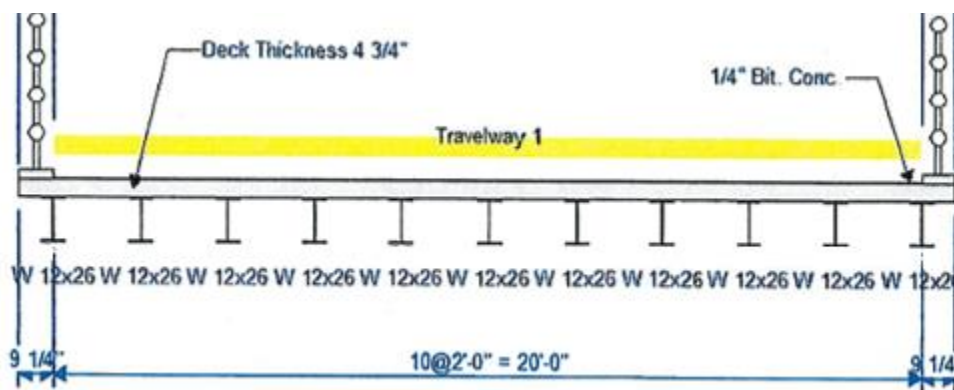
Typical Cross Section of the 1993 Holdens Creek Bridge
